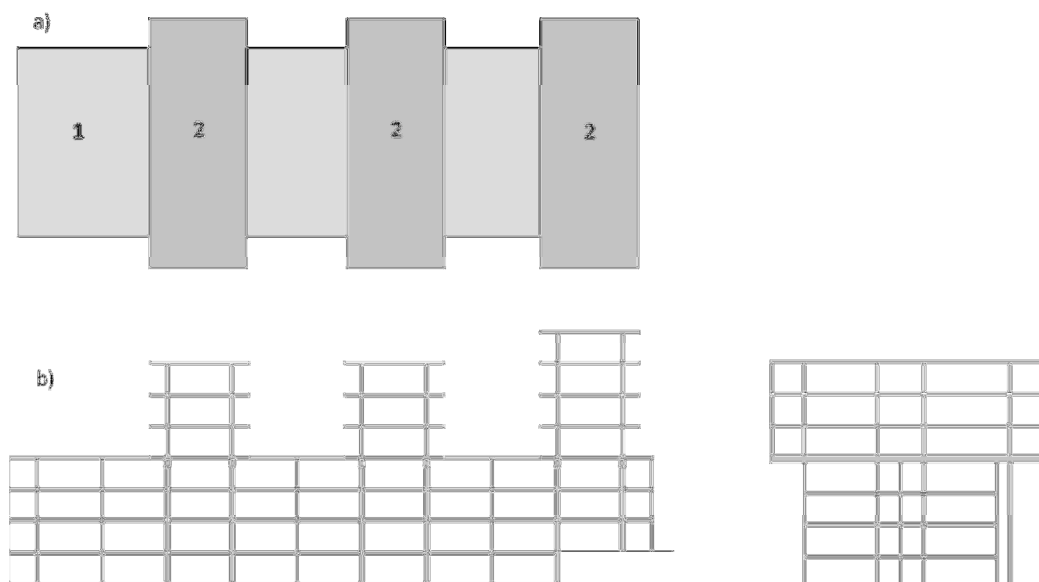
, Simplified illustration of Studio 57; a) overview from above where 1 shows the old garage and 2 shows the extensions b) section in longitudinal direction c) section in transversal direction.
